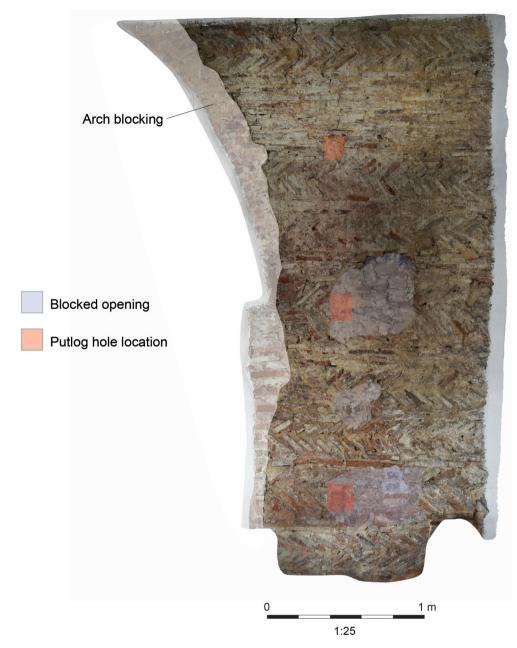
Rectified photography of internal elevation of brick-built north wall of the nave.
